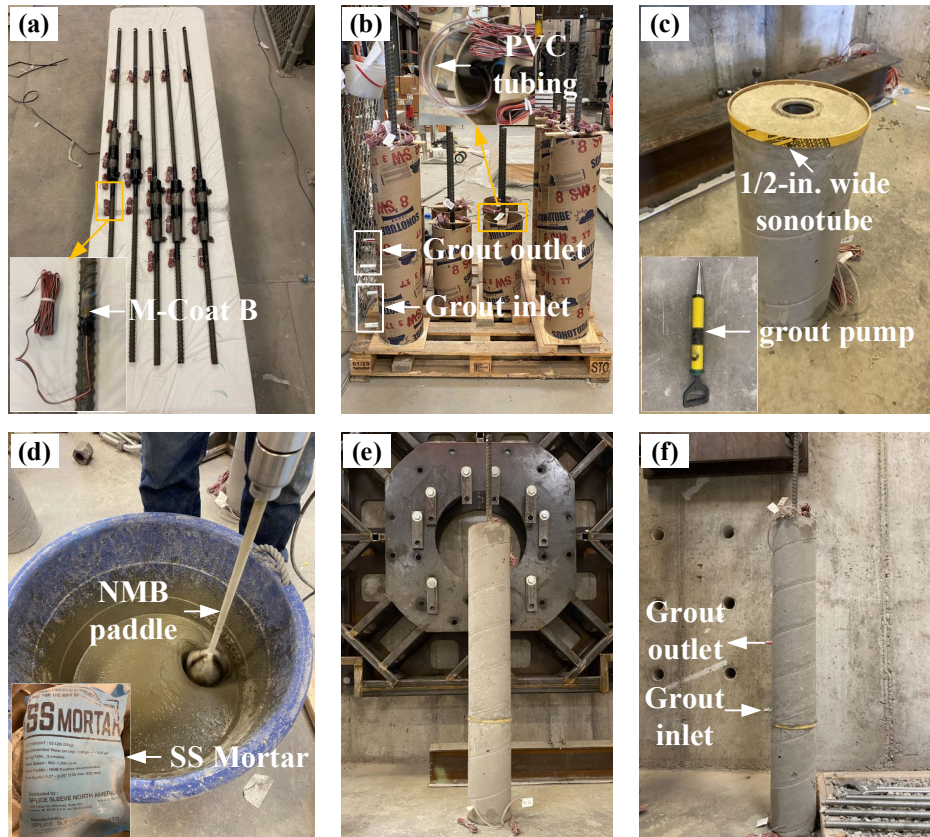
Construction procedures of specimens: (a) attachment of strain gauges, (b) formwork of cylinders, (c) formwork of bed grout, (d) grouting preparation, (e) GSS-F assembly, (f) GSS-C assembly
